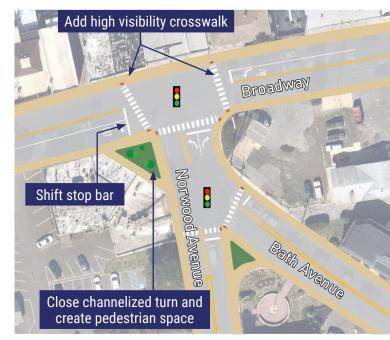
Intersection of Norwood Avenue, Bath Avenue, and Broadway Recommendations
